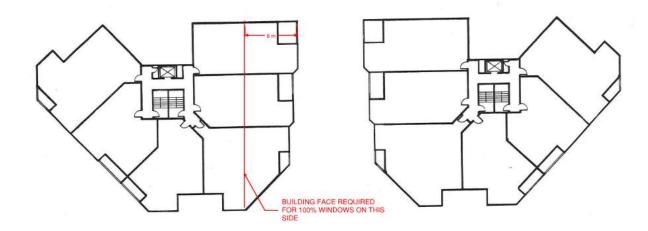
ORIGINAL PUD PLANS SHOWING A NEW SETBACK IN ORDER TO ACHIEVE FOR WINDOWS IN THAT BUILDING SIDE.
